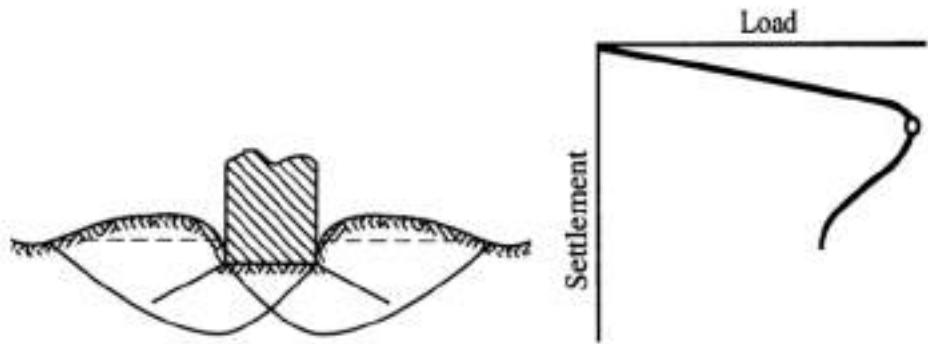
Shallow Foundation Bearing Capacity Failure (General Shear Failure)
